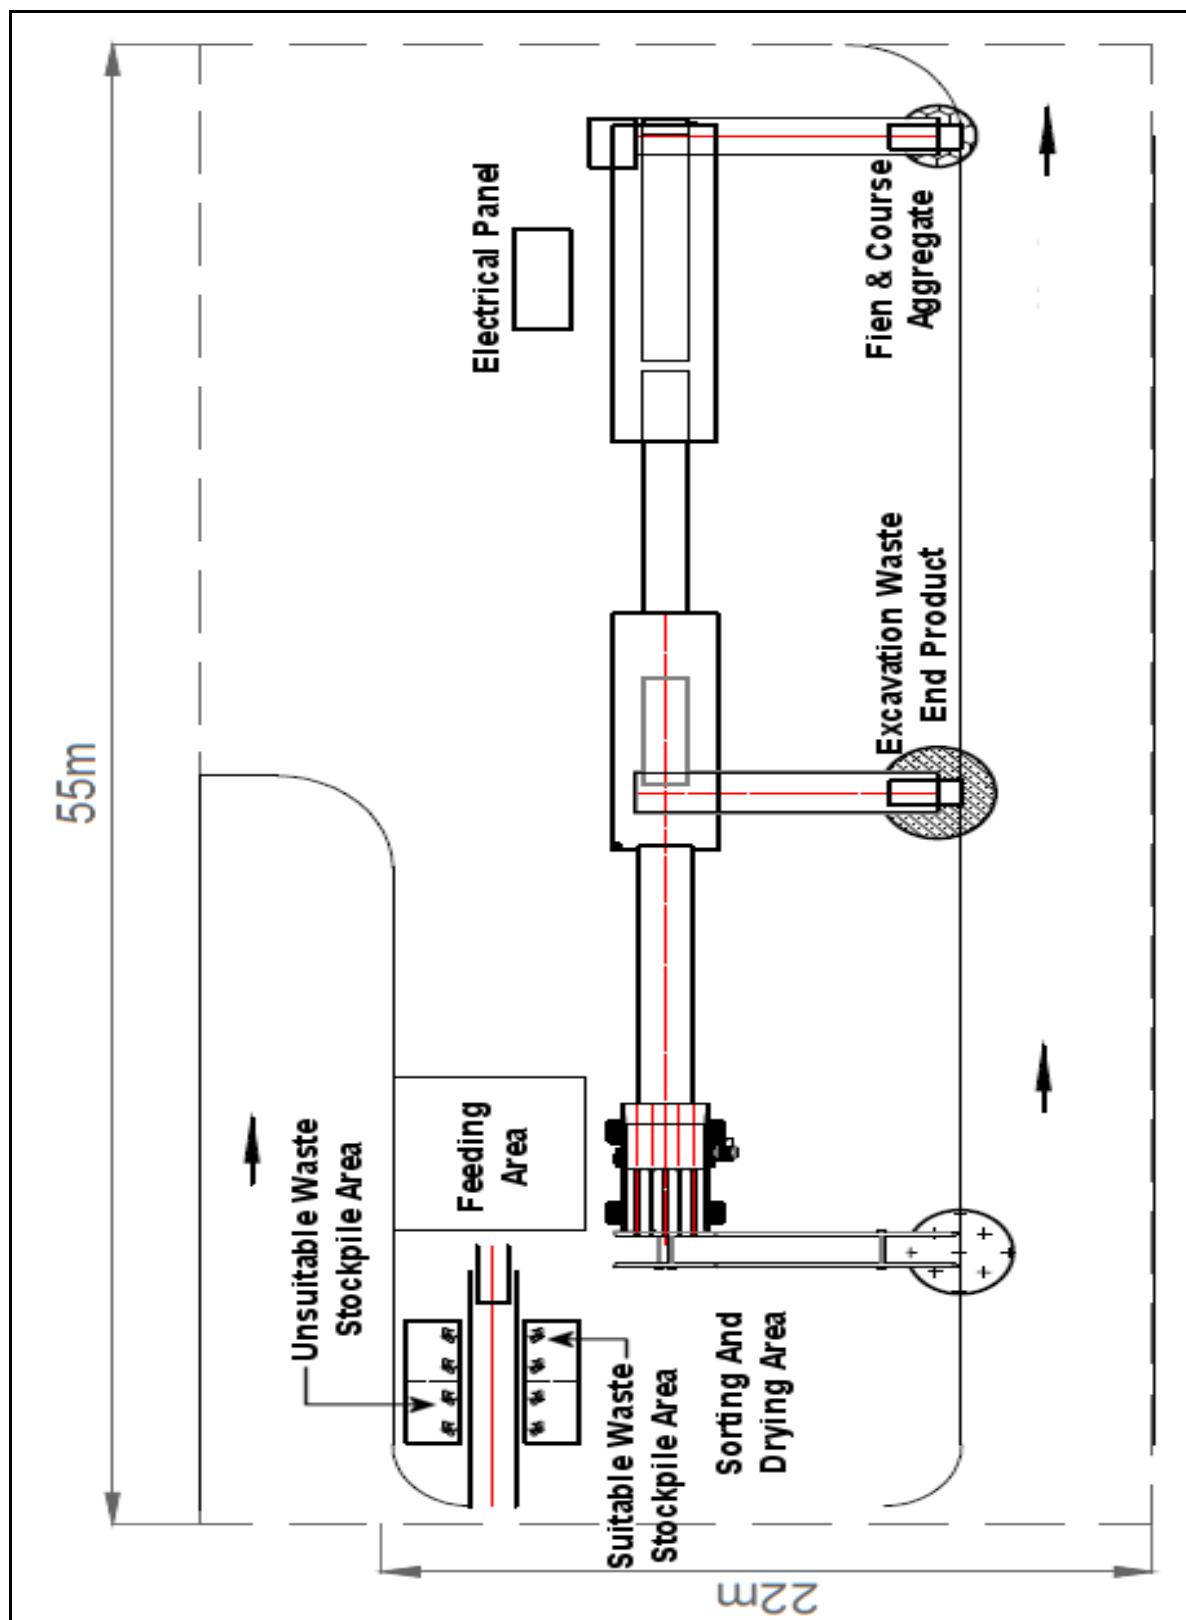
Typical Layout For Recycling Plant With Stockpile Areas
